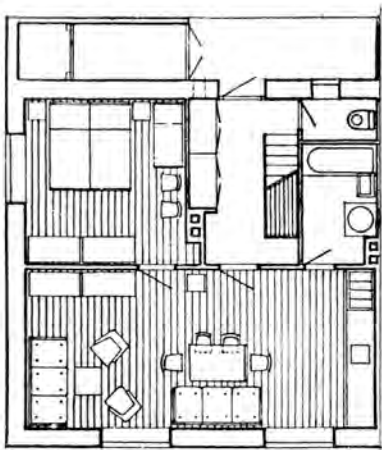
T42 DUPLEX PLAN, 1950.
